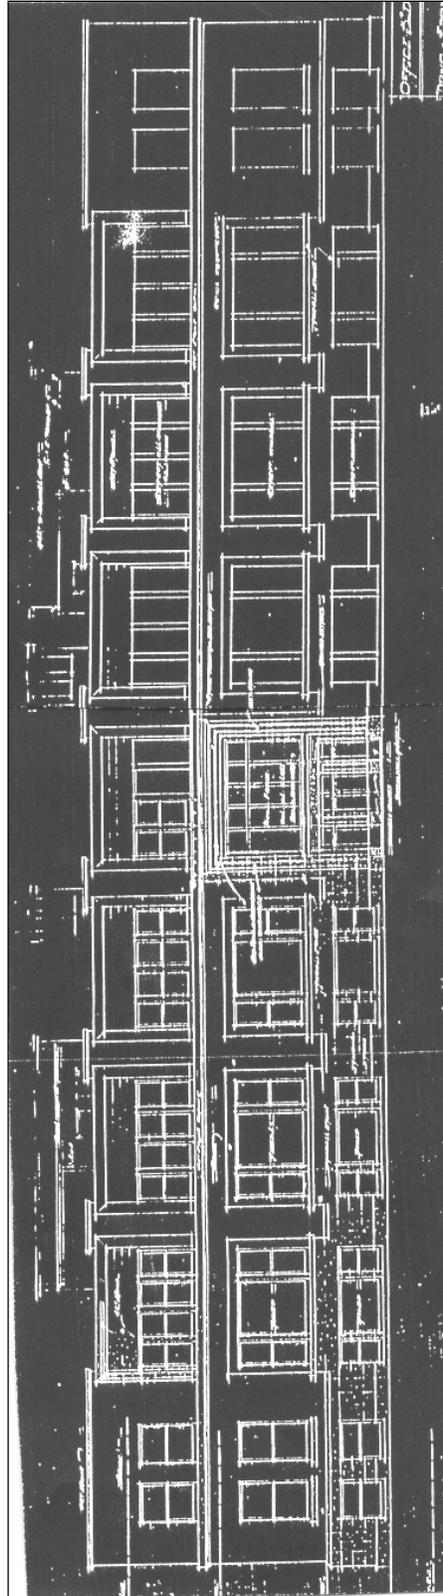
365 Bannatyne Avenue, former Stovel Company Building, original plan of south façade. (City of Winnipeg Archives, Plan #346/1916.)
